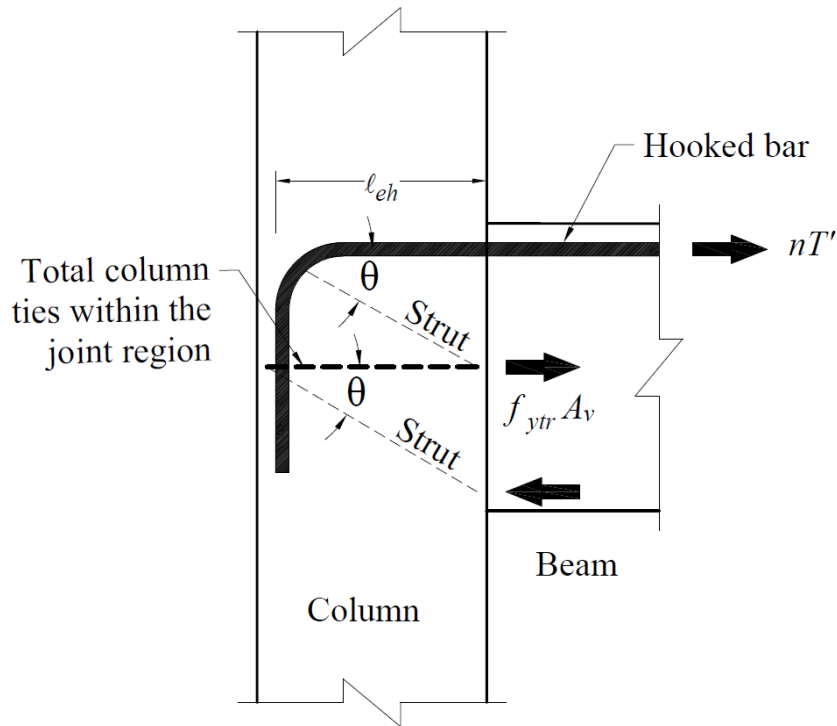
Load transfer within the beam-column joint based on the strut-and-tie mechanism (column longitudinal reinforcement and beam compression reinforcement are not shown for clarity)
